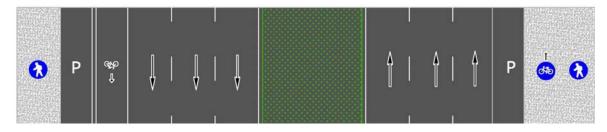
I: Old Colony Avenue Alternative B Cross Section
